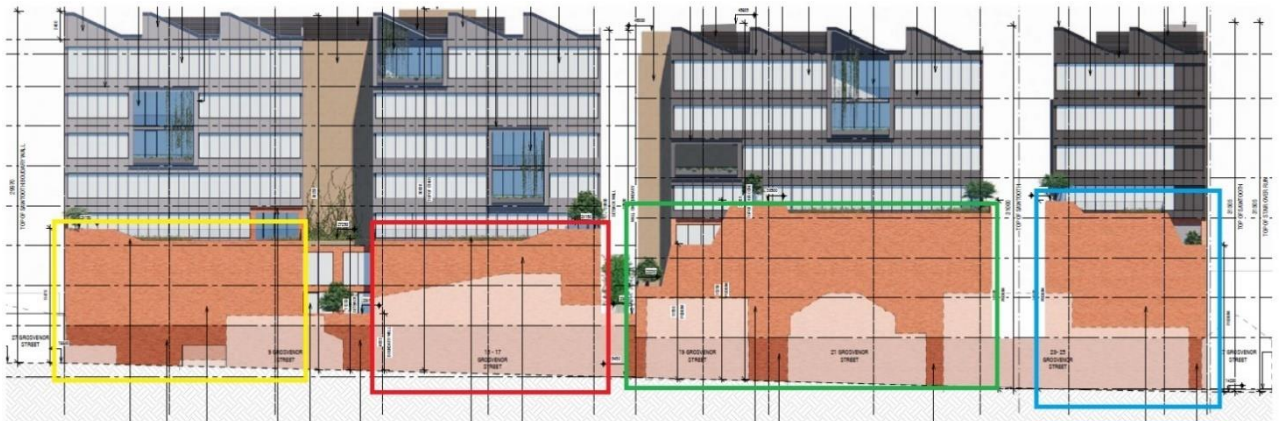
Eastern elevation identifying varies on-boundary walls by way of height and breaks with Grosvenor Street buildings in the forefront.
